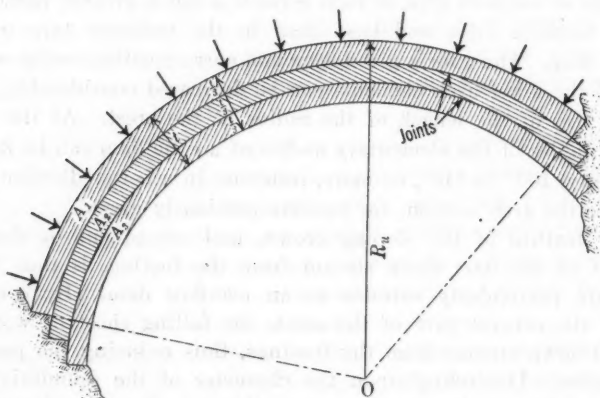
HORIZONTAL SECTION THROUGH A LAMINATED ARCH DAM.
